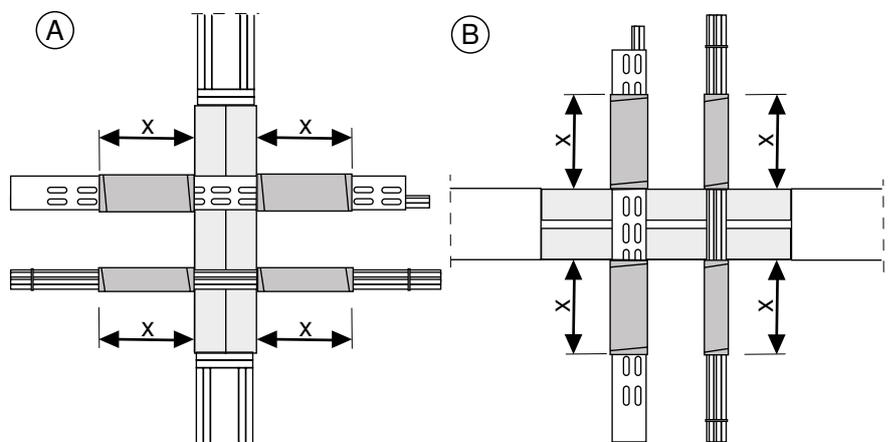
Fire protection bandage FSB-WB 1.5 on cables on wall and ceiling
